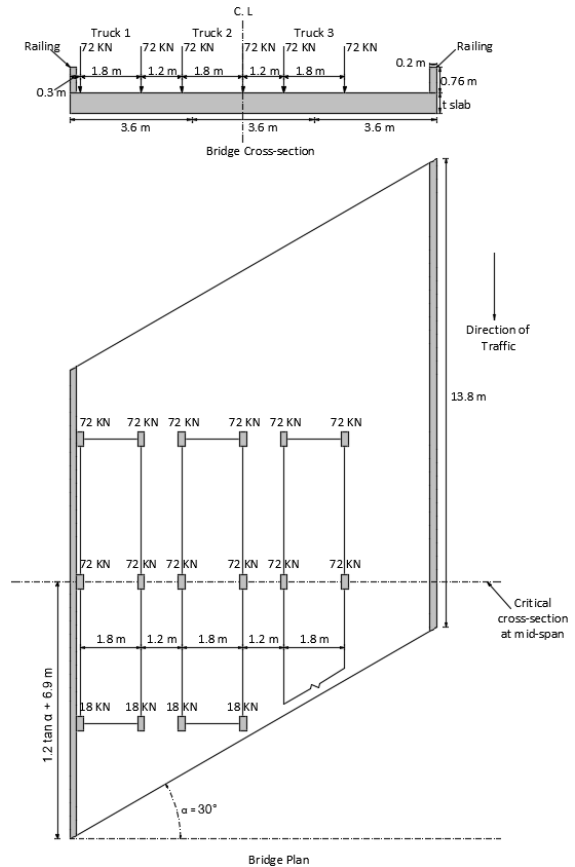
Typical cross-section and layout for a 13.8 m (46 ft) span, three-lane, 30 degrees skewed bridge with railings, subject to HS20 Edge loading condition.
